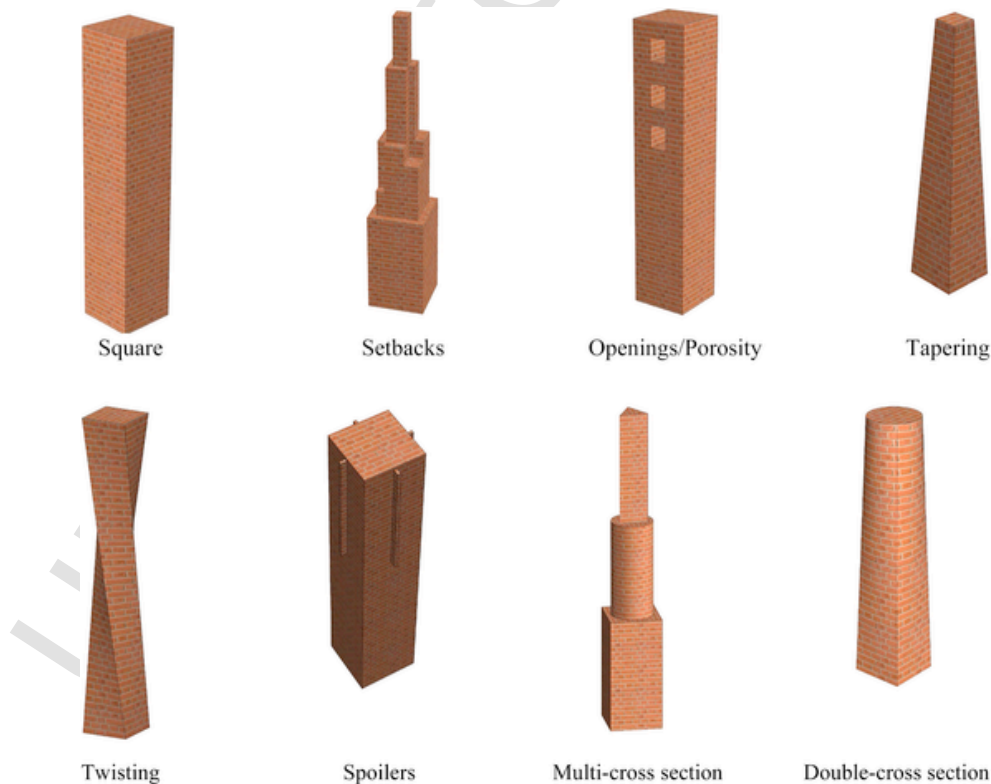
Typical shape (major) modifications applied to tall buildings.
